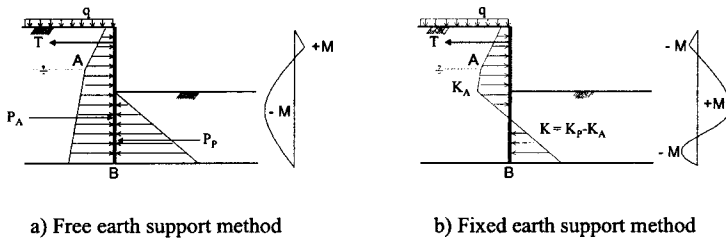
Earth pressure and bending moment acting on anchored sheet pile wall
